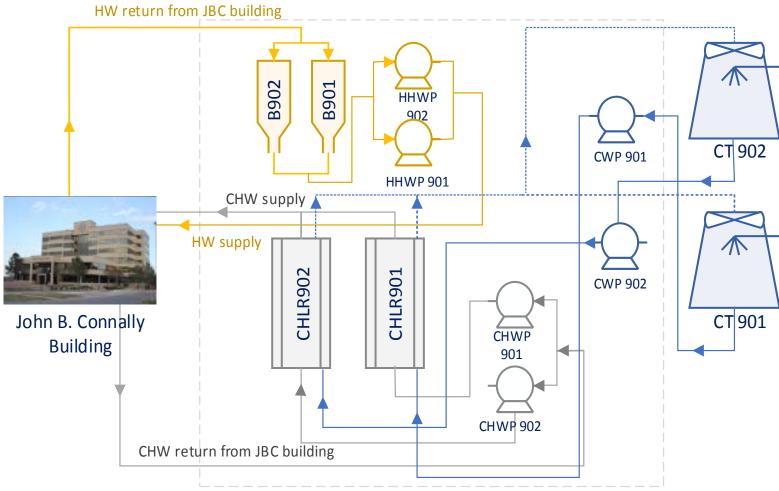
Simplified JCB Building Plant Diagram of the Heating and Cooling System
